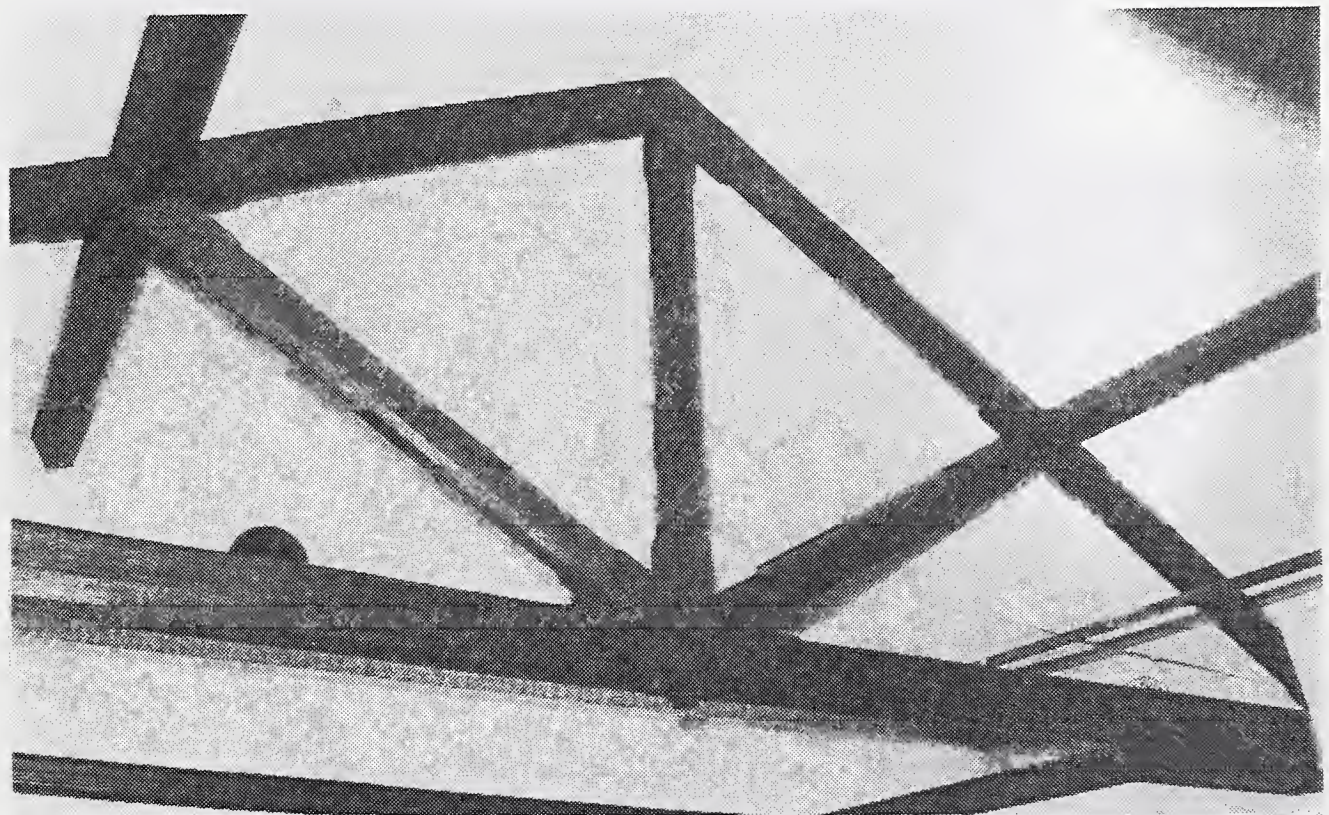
North Wing Roof Trusses. Note Access Holes for Bedbolt Nuts About One Foot in from Ends of Kingpost.
